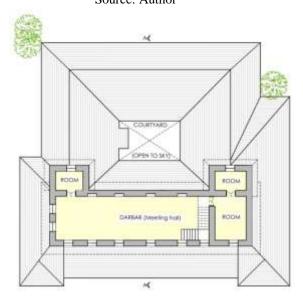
b: First floor plan of house of the elite class, Sawantwadi. Source: Author
